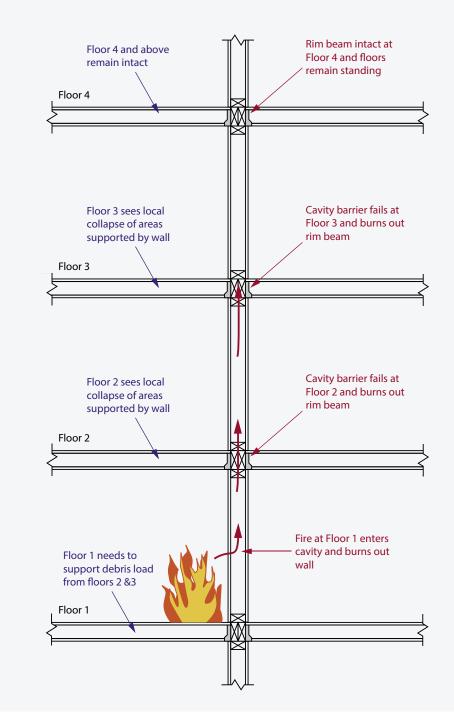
Loss of two storeys of load-bearing walls in a load-bearing timber stick-framed building.
